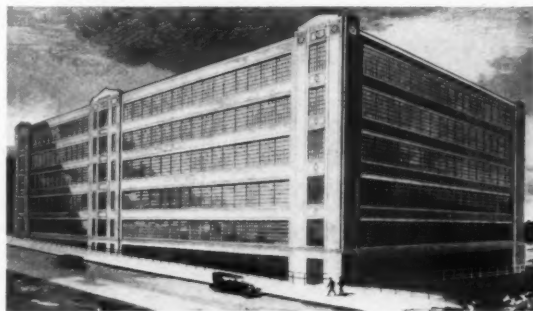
New factory building for James Lees & Sons Company, Bridgeport, Pa.
